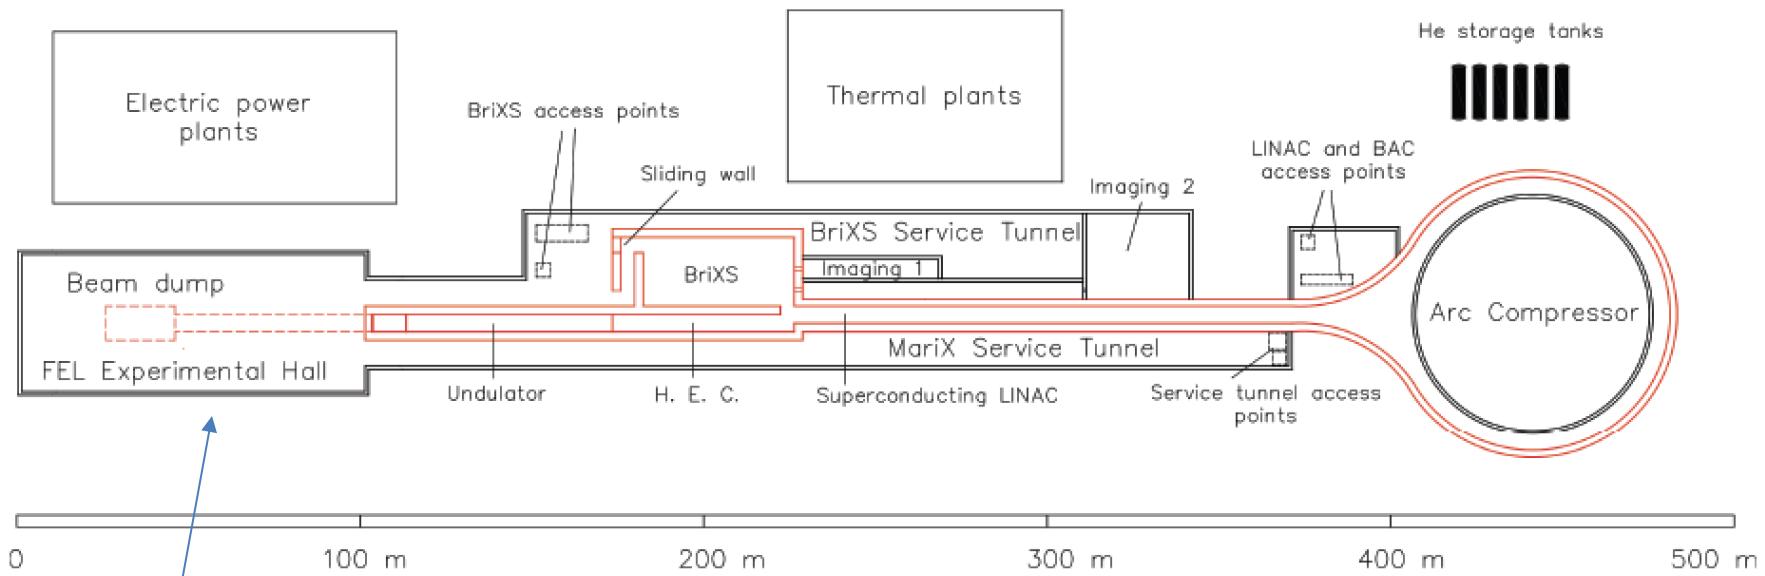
General layout of the BriXS-MariX facility with all the underground buildings and the various areas reserved for plants.
